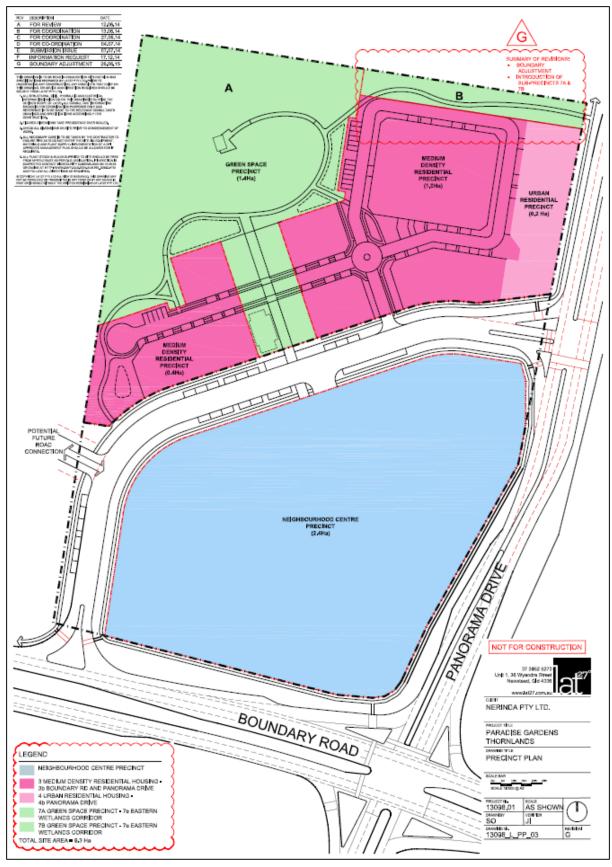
PARADISE GARDENS PRECINCT PLAN (26-6-15)
